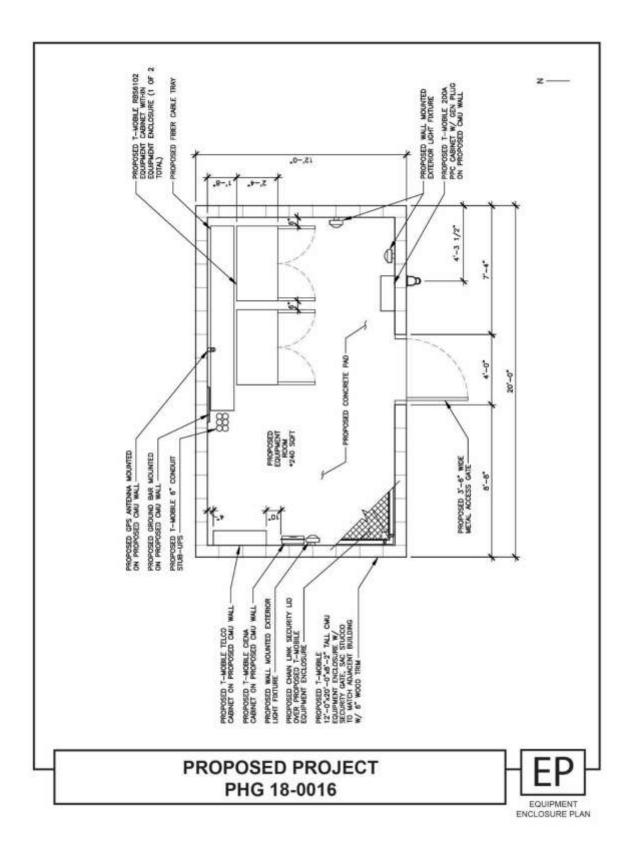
EXHIBIT "B" PROJECT PLANS PHG 18-0016
